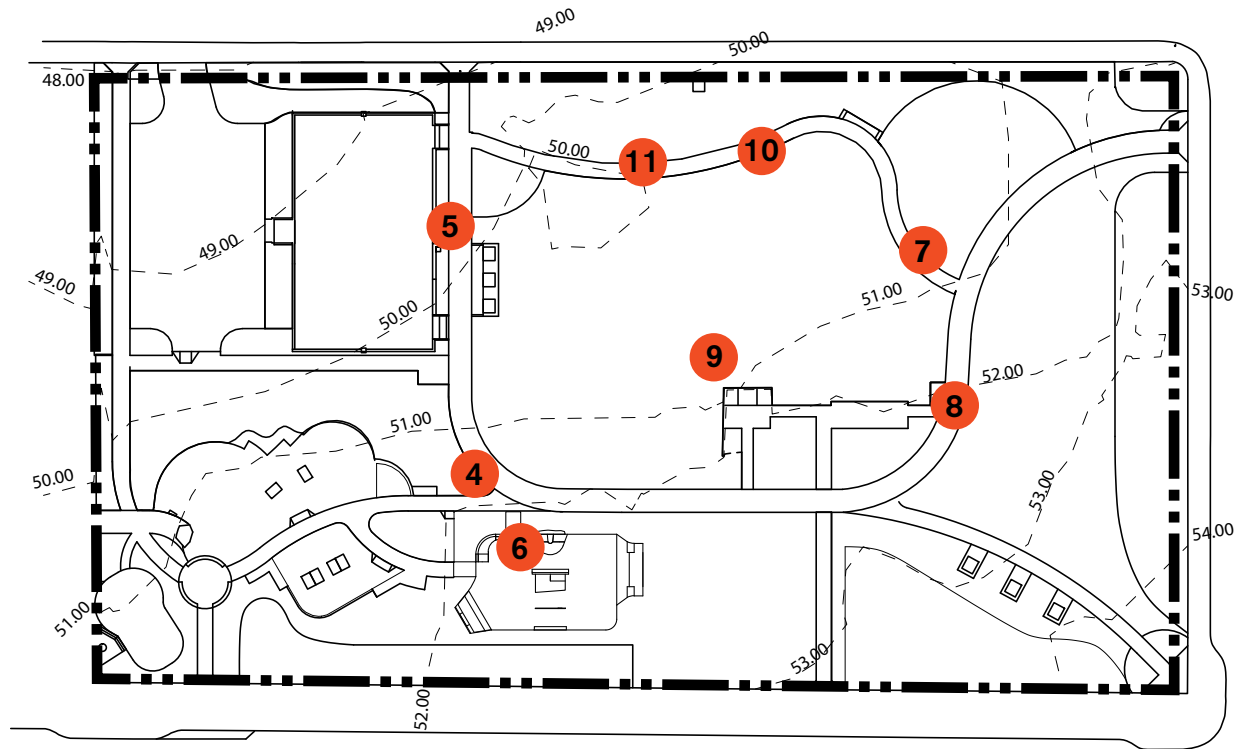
Existing Site, 1m Contours, Site Photo Locations
